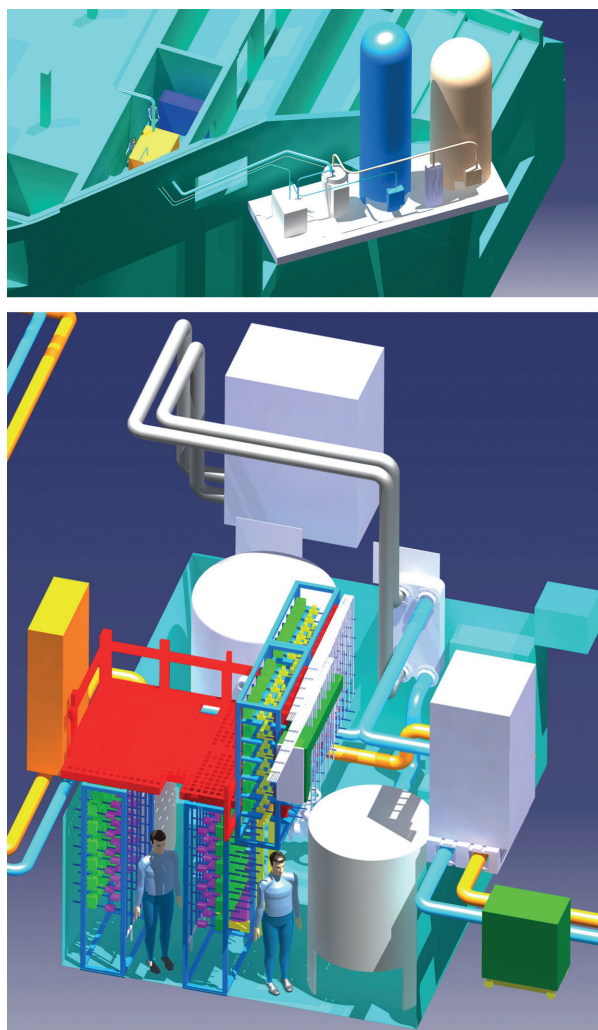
LN2 plant on common foundation with gas tanks. Bottom: Pumping pit with 3 under-pressure systems (Both illustrations by D. Glaab, GSI).
